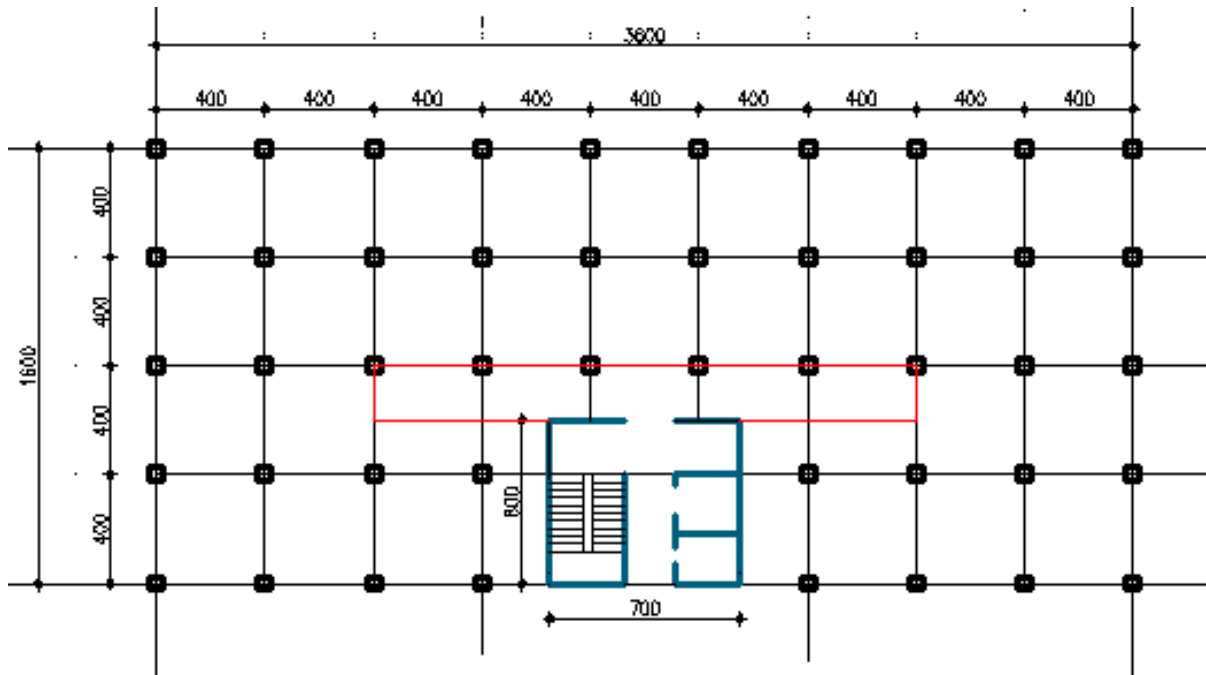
Rectangular structure with dimension 16x36 m and with columns axis, every 4 m with concrete core wall to one side with dimensions 6x7 m (source: the author)
